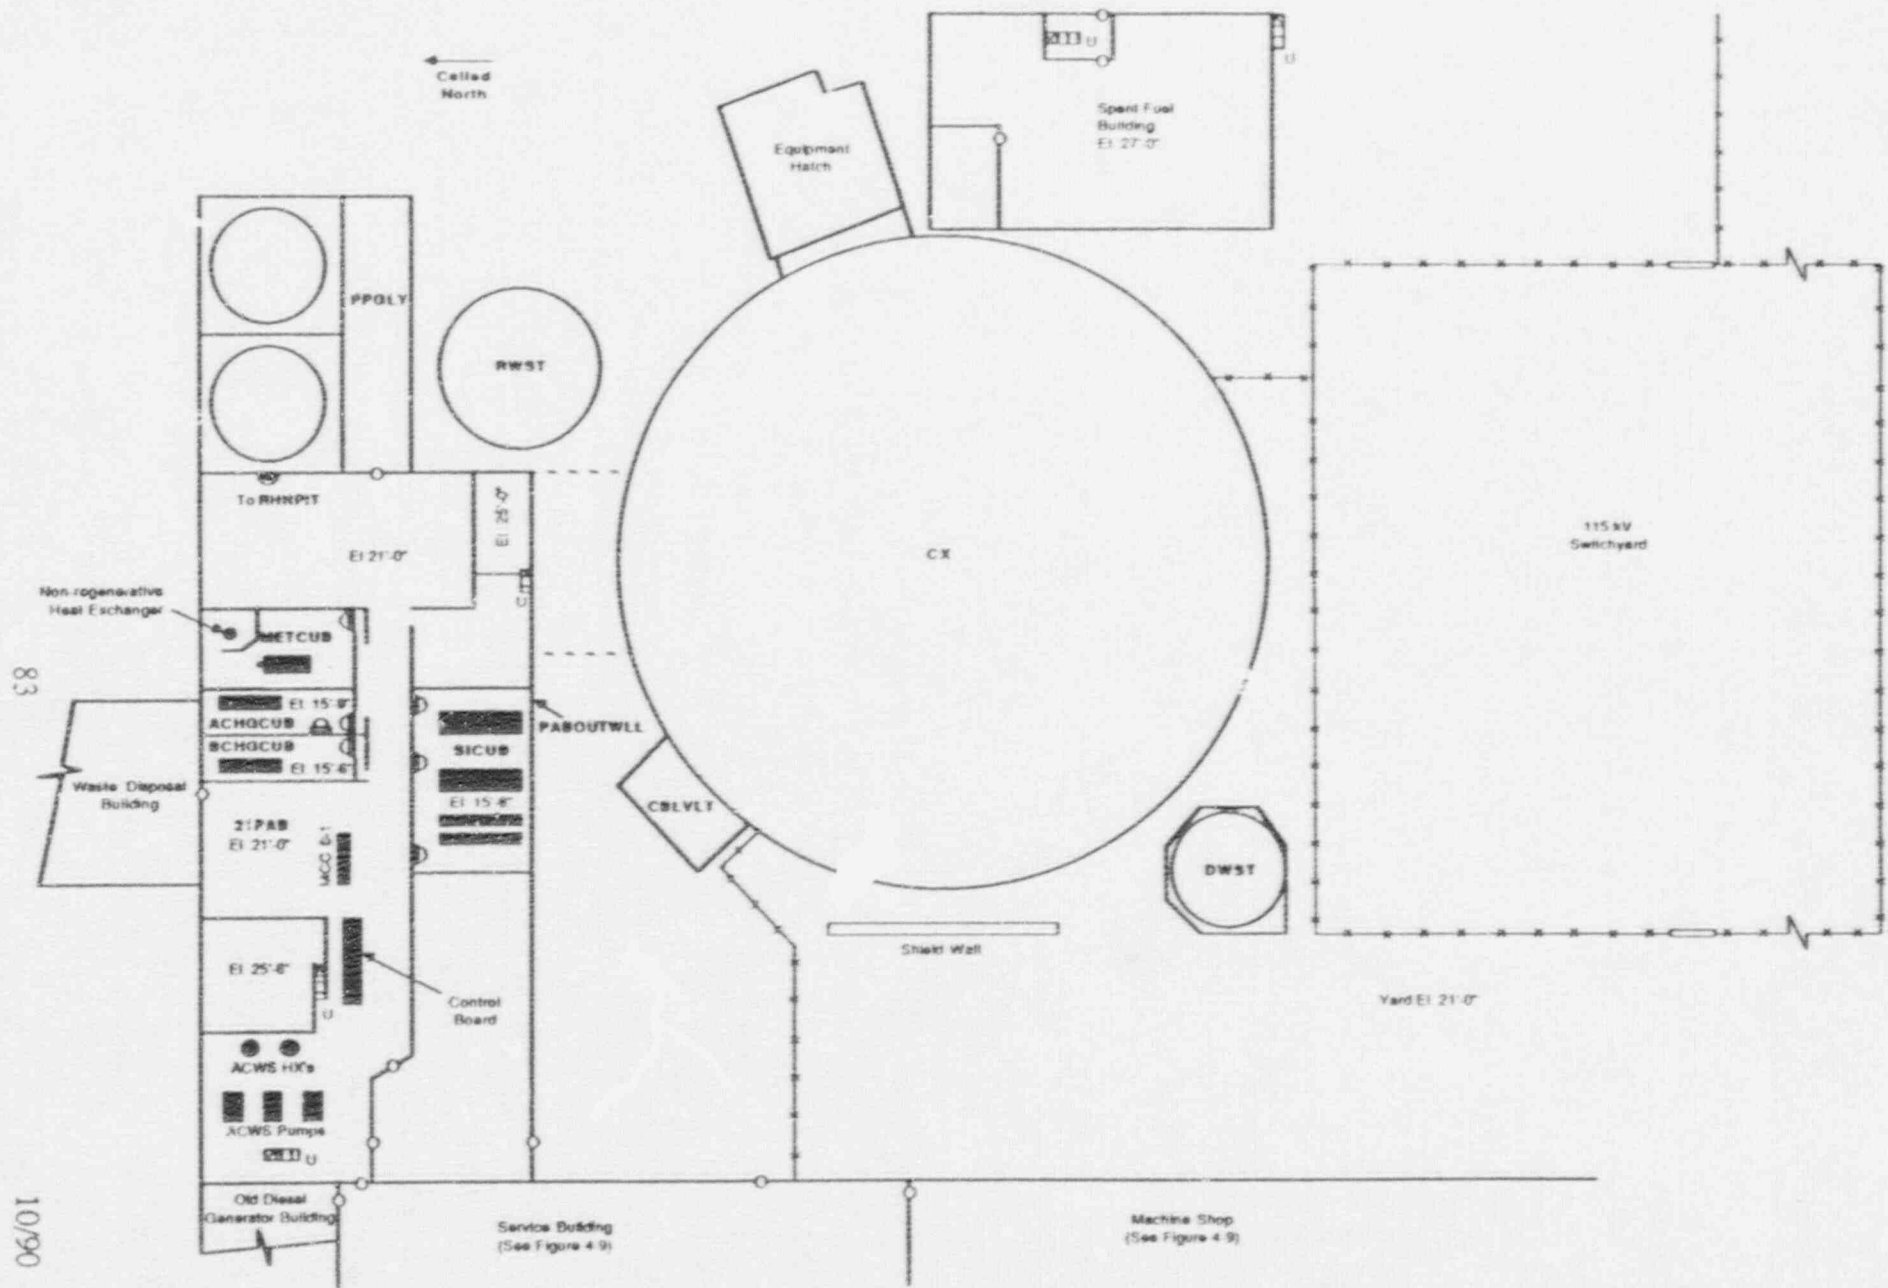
Haddam Neck Reactor Containment, Auxiliary Building, and Spent Fuel Building, Elevation 21'-6"
